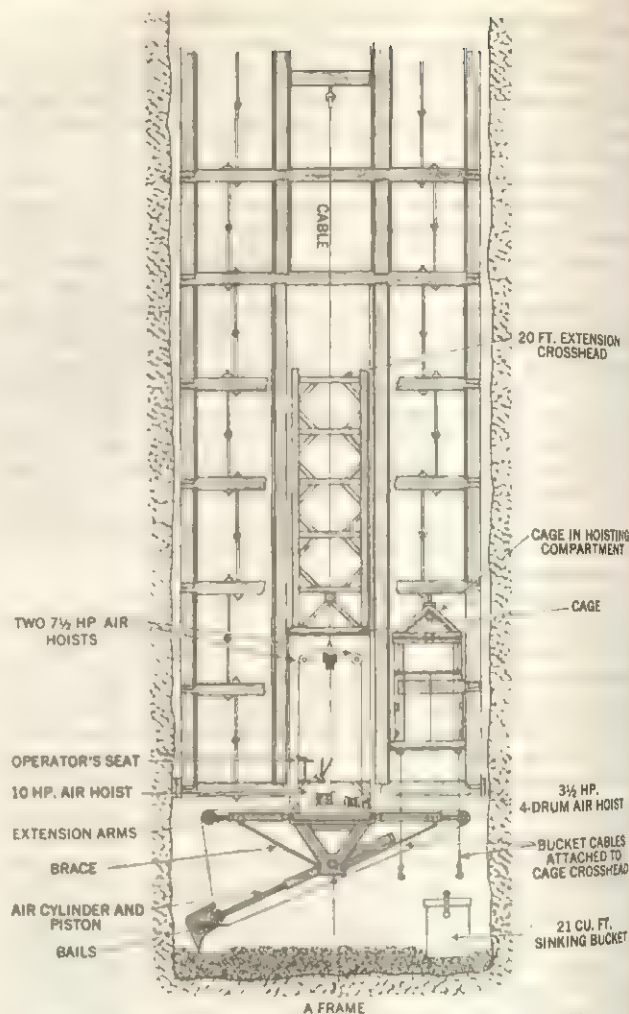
SHAFT MUCKER USING POWER SHOVEL PRINCIPLE
